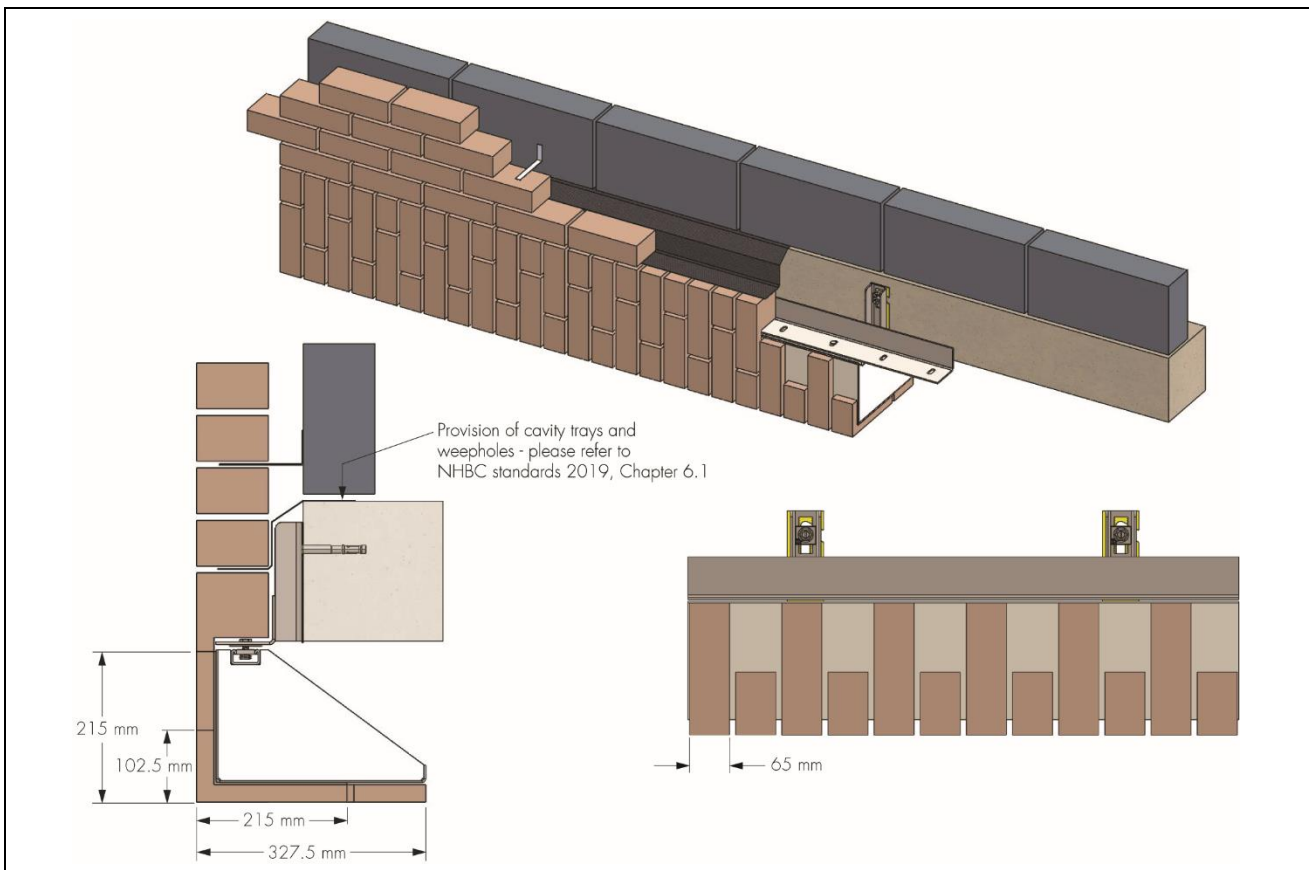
BOSS 65 x 215 mm with header bond (welded masonry support, shims and anchor bolts are outside the scope of this Certificate)
